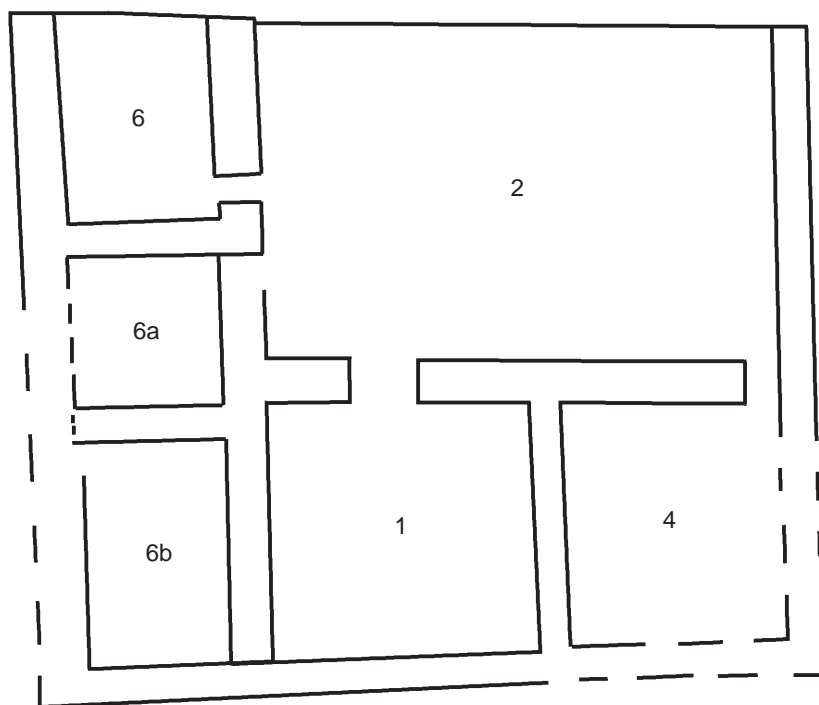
Farmhouse no. 49. Plan of the first building phase.
